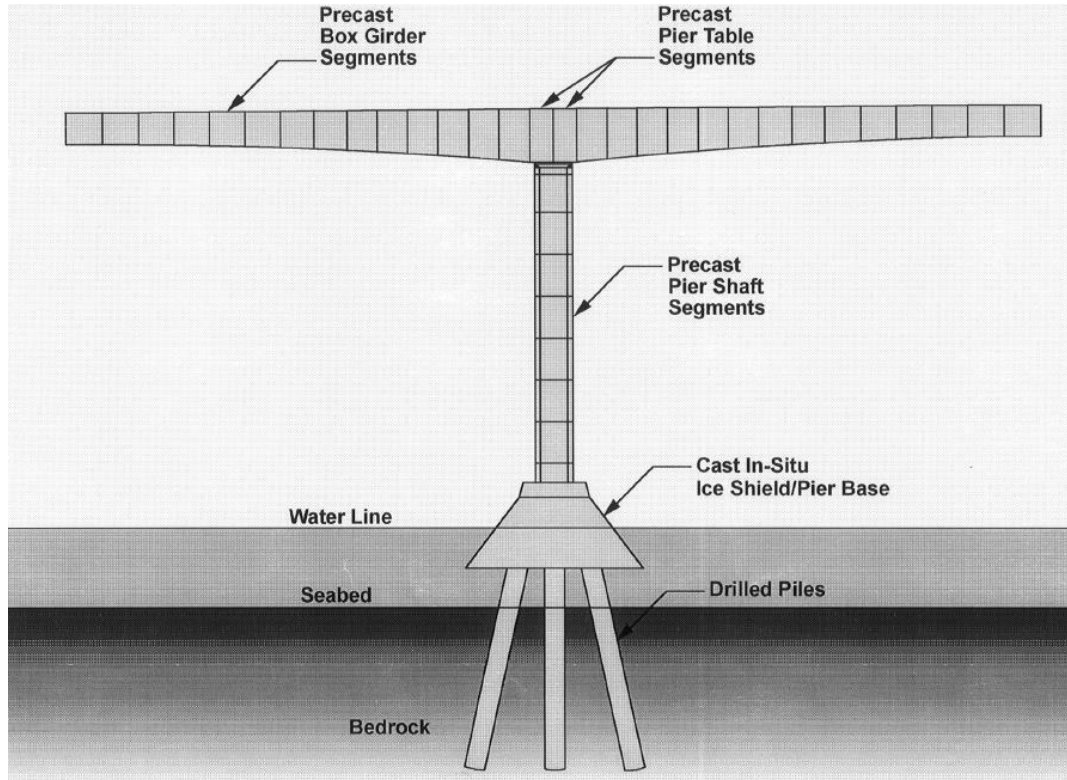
Typical elevation view of The Confederation Bridge pier and deck [28].
